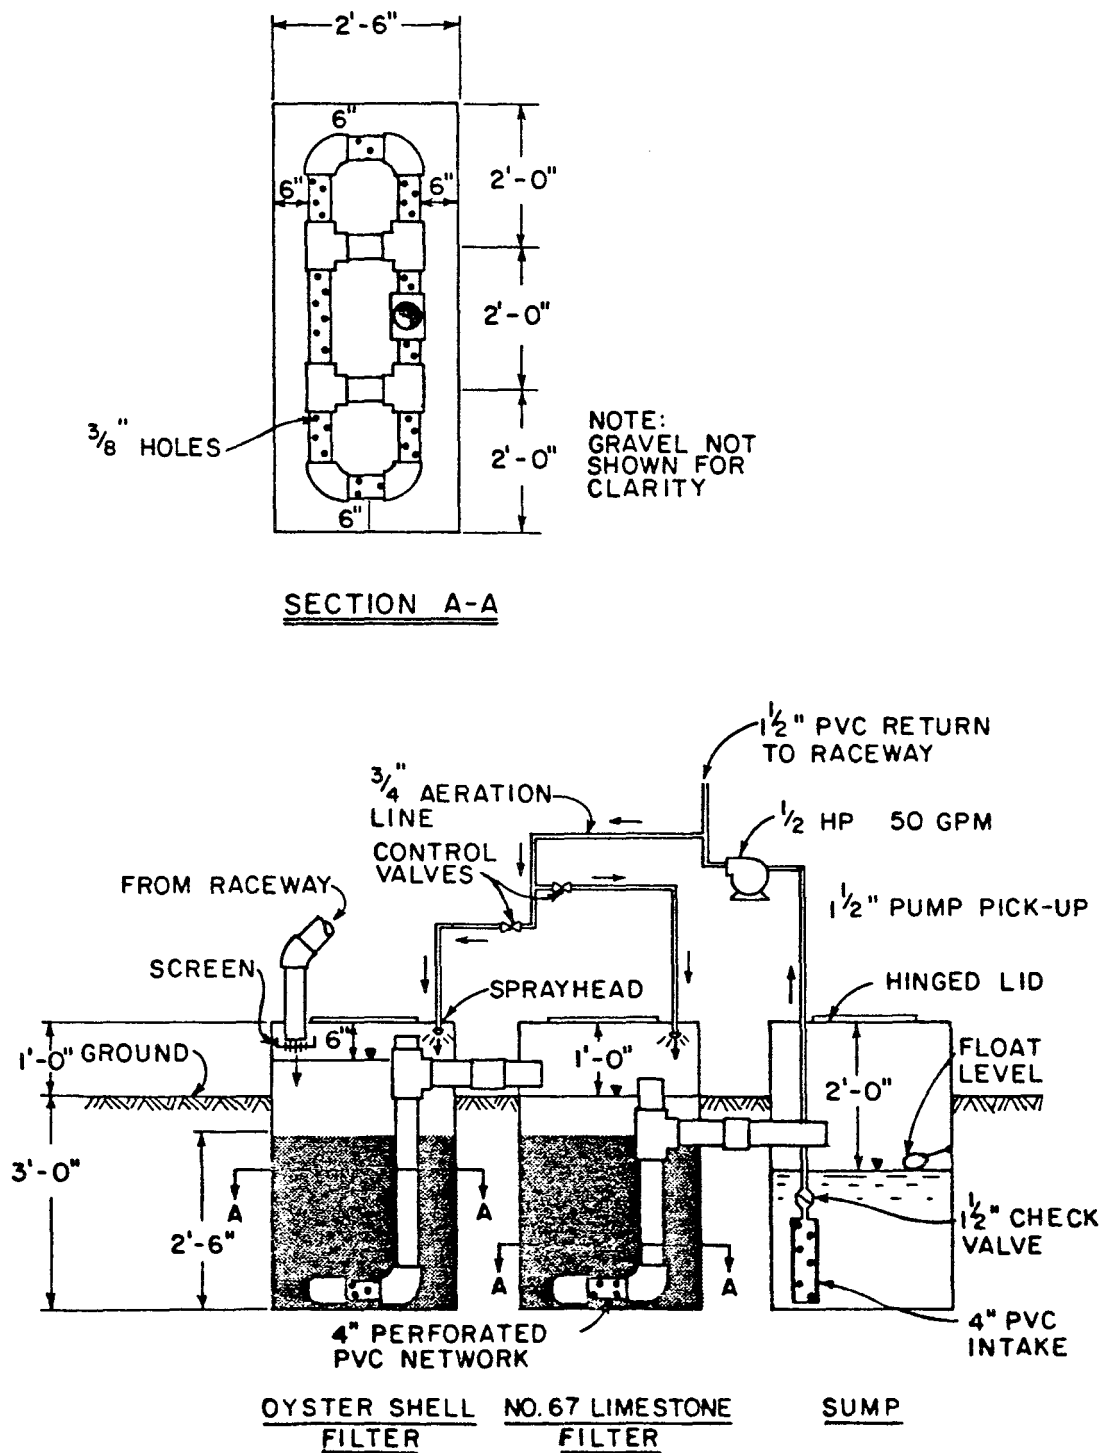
Details of the filter design, underdrain system, and piping required for the proposed raceway system.
